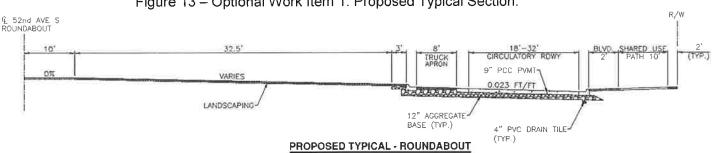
Optional Work Item 1: Proposed Typical Section.
